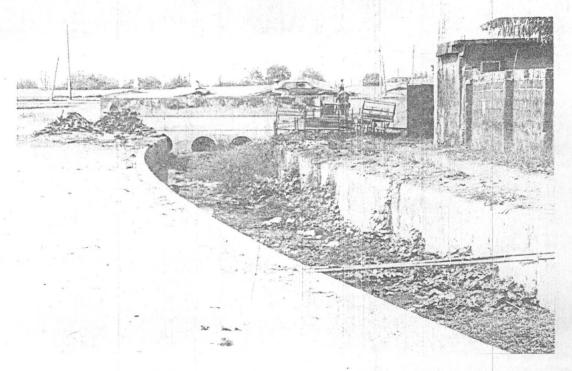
The drainage channel that cuts across the Tunga market, Minna, concretized and also protected at the bank during its construction
